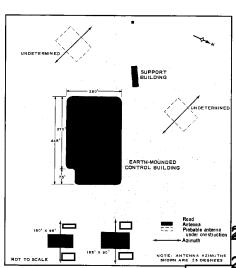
EARTH-MOUNDED CENTRAL CONTROL BUILDING AT ANTENN.
